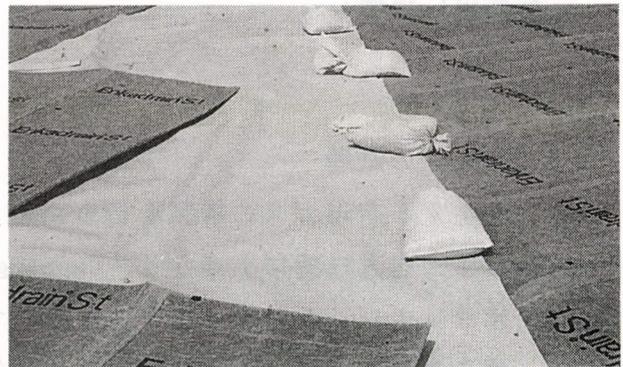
Compact "gas conducting - liquid sealing - water draining" sandwich.
